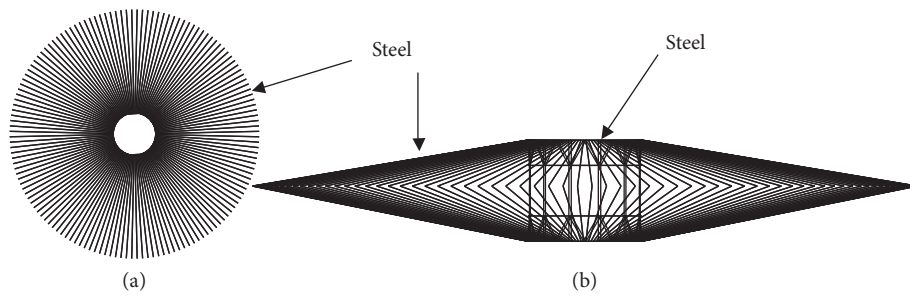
Roof structural view. (a) Top view. (b) Side elevation.
